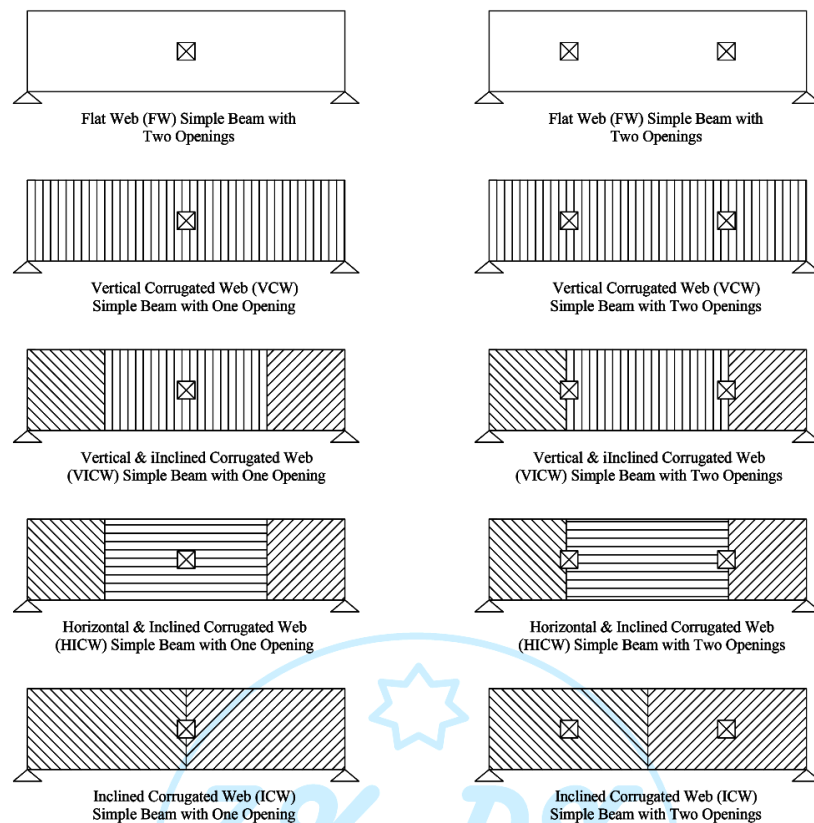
Profiles of studied models of the simple beams with one & two openings
